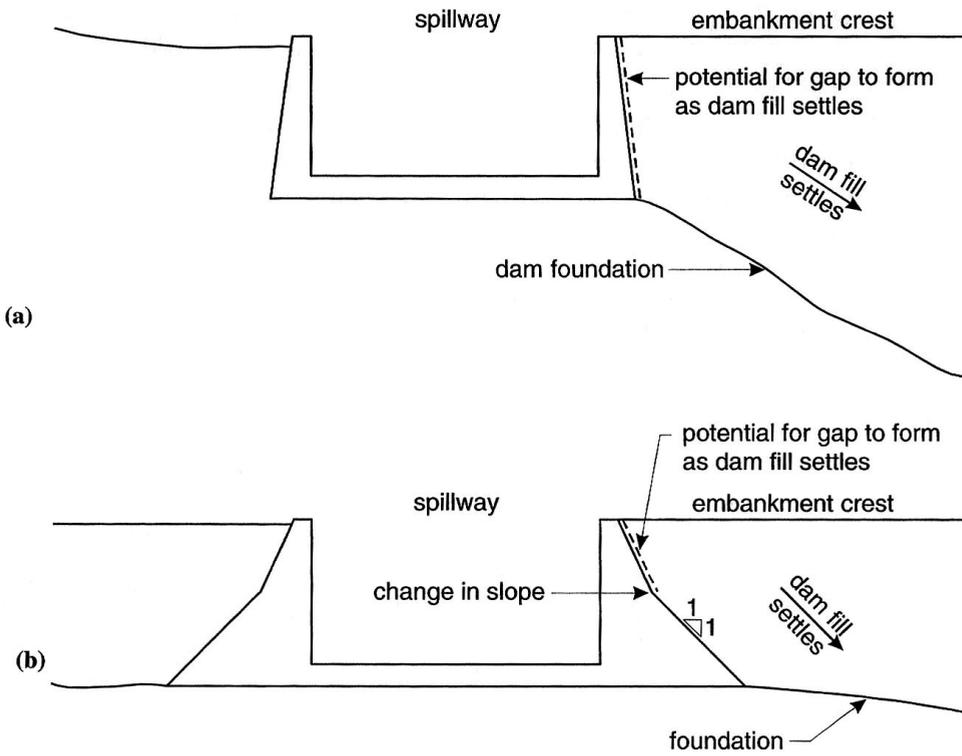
Situations where a crack might form between the dam fill and the spillway wall: (a) steep foundation adjacent to spillway wall; (b) change in slope of the retaining wall (Fell *et al.*, 2005).
